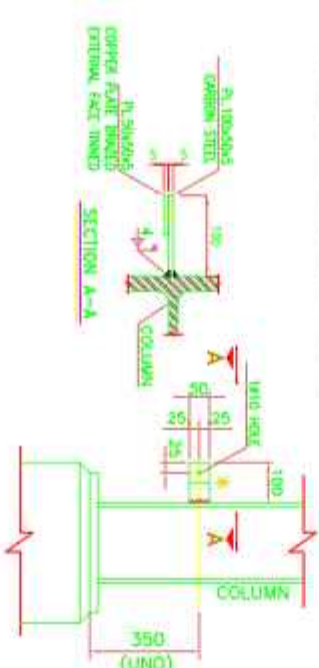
STEEL STRUCTURE FABRICATING DETAILS
